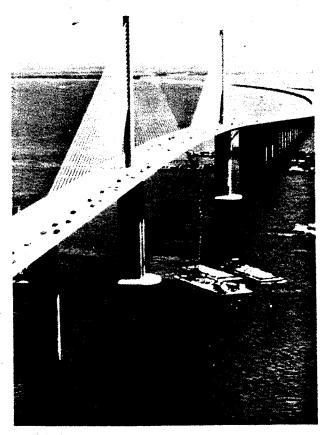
Sunshine Skyway Bridge (Source: Figg Engineering Group)
